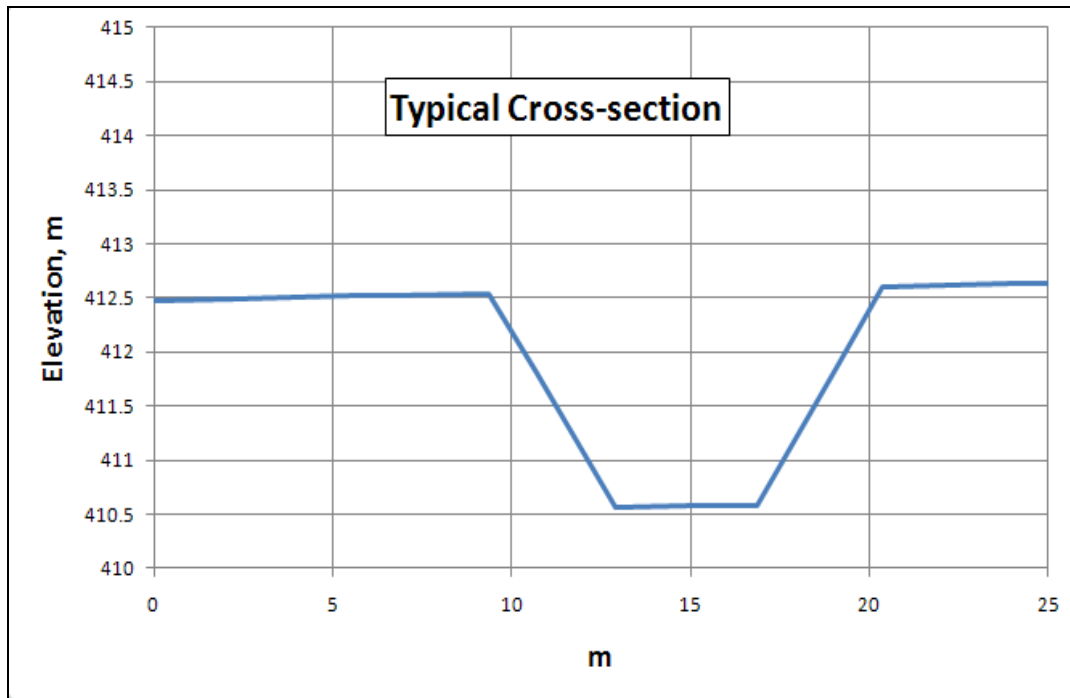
Typical cross-section for Alternative 1 diversion ditch.
